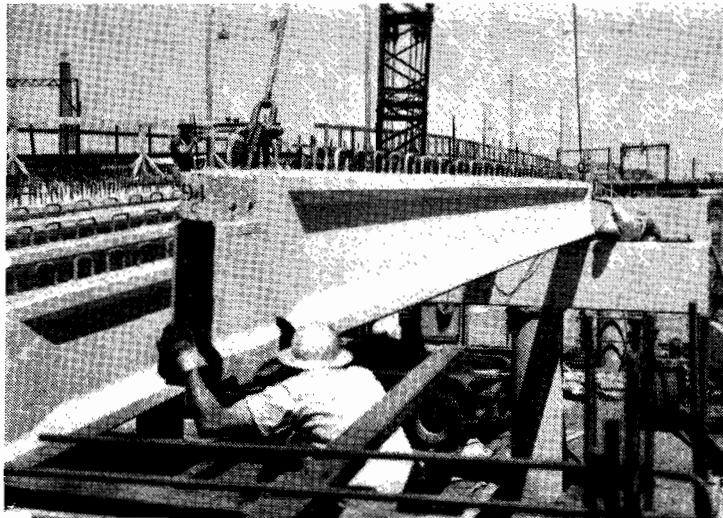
Seating prestressed concrete beam on the Flinders Street Overpass.
